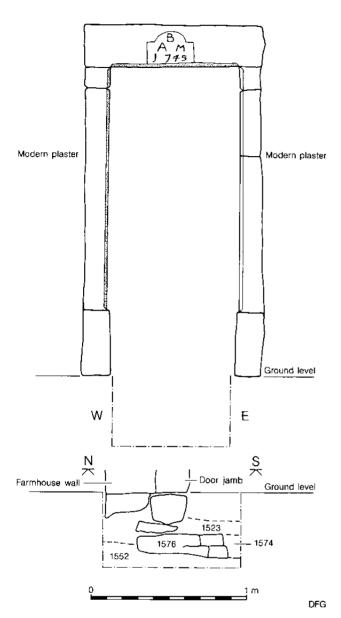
Period 10 doorway to farmhouse, and section around foundation block
